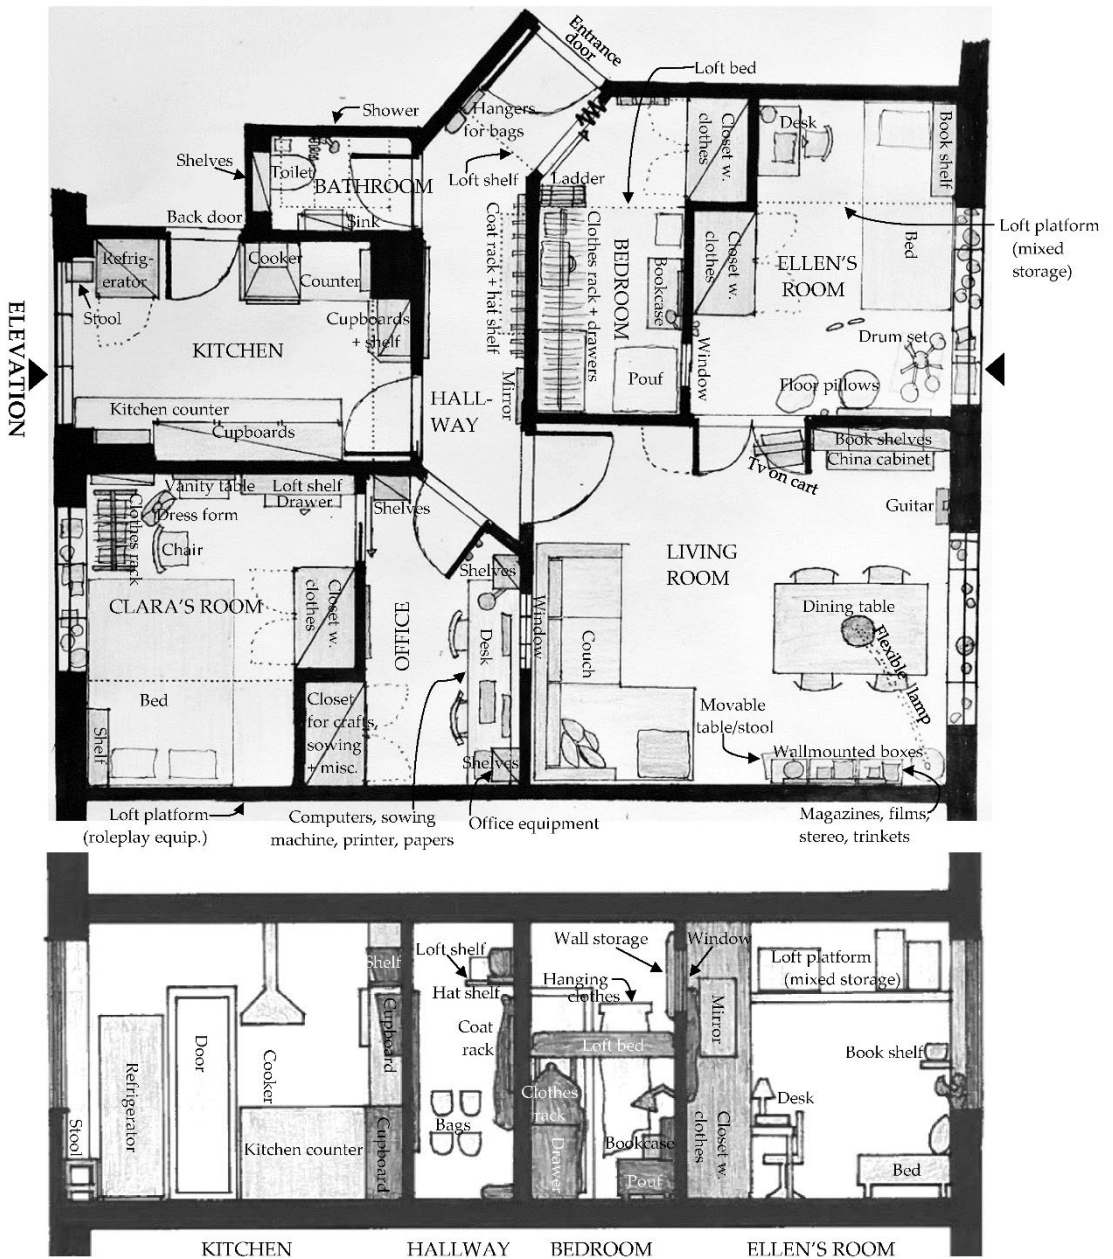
Plan and cross-section of dwelling in Case #1. Illustration by author.
